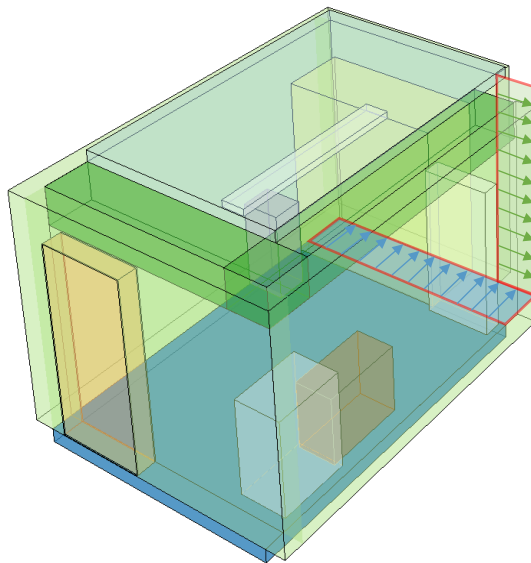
Extension of the floor and wall elements to correct the lack of modelling shown in Figure 4.10
